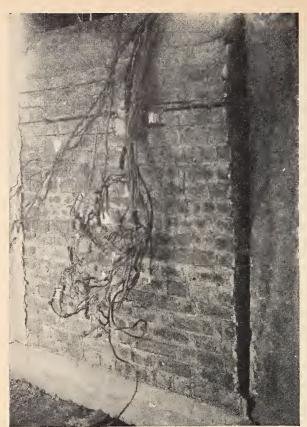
Unexposed side of 12-in. wall 44 of clay bricks from source CLI after failure under load at 10 hr 21 min in fire-endurance test.
